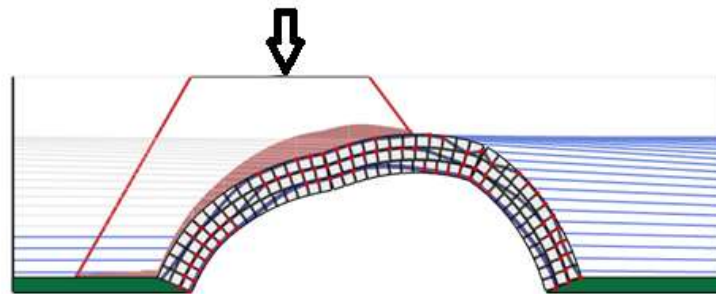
Collapse mechanism for arch loaded by 1.5 m square footing, column position at arch quarter span.
